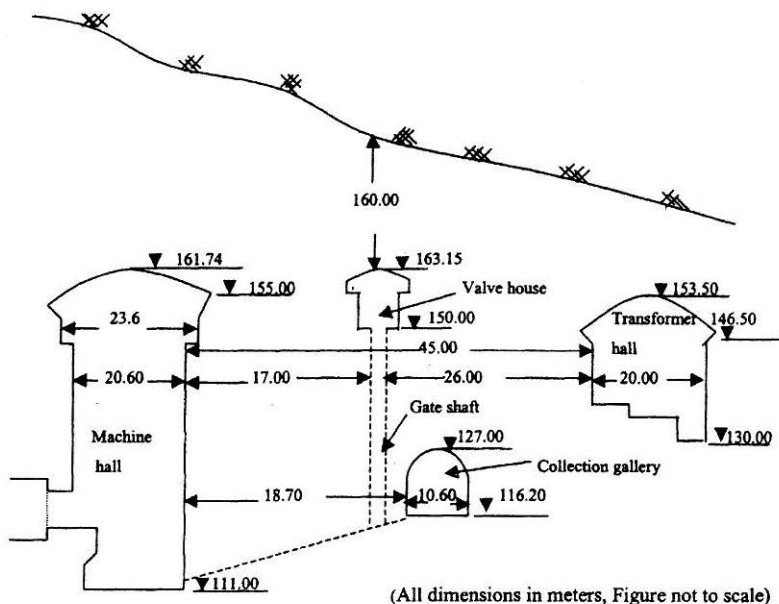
Details of the Opening at Koyna Hydro Power Project
